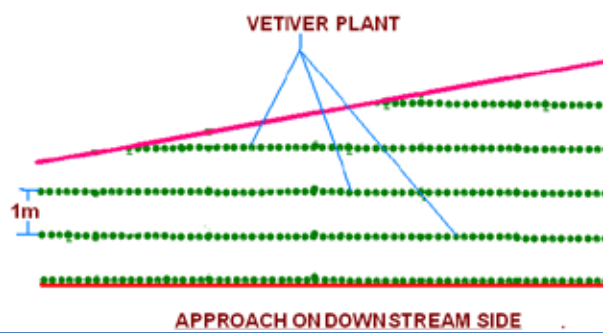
Slope Protection @ Bridge approach (Downstream side)
